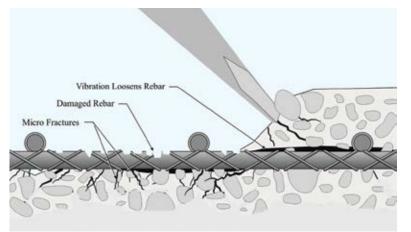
Microcracking of concrete substrate caused by handheld concrete breakers
